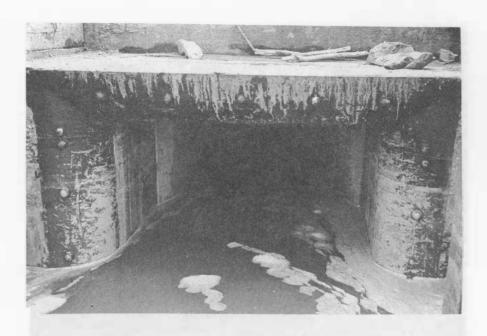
A rounded inlet to the sluice through Abt. #5, Glenholme Marsh, Gol. Co., N.S. The quarter-round steel section is lag screwed to the ends of the timbers, and filled with concrete. There is a noticeable improvement in flow through the sluice as a result. (Photo 64-023).
